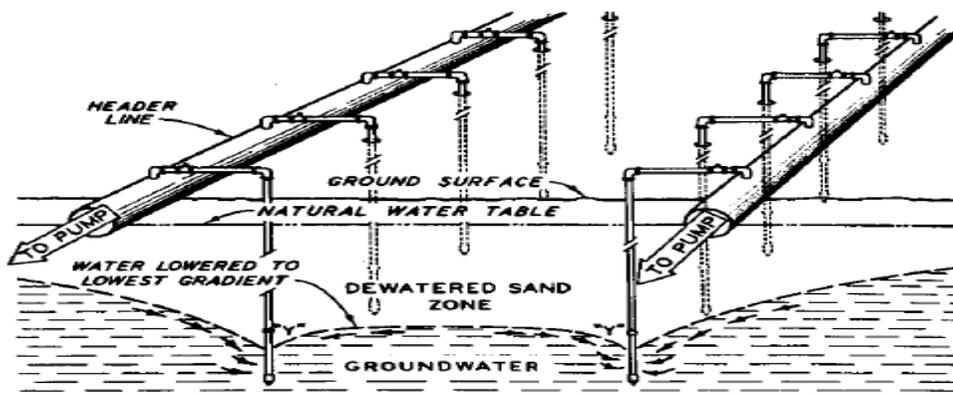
Sketch of a single-stage, well point dewatering system [1].
